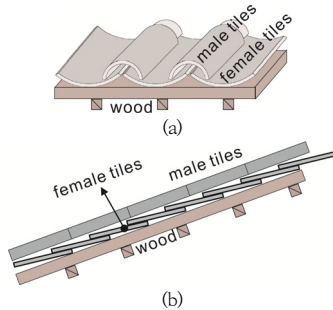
Korean-style clay roof construction-dry method (a) side view (b) cross-sectional view
